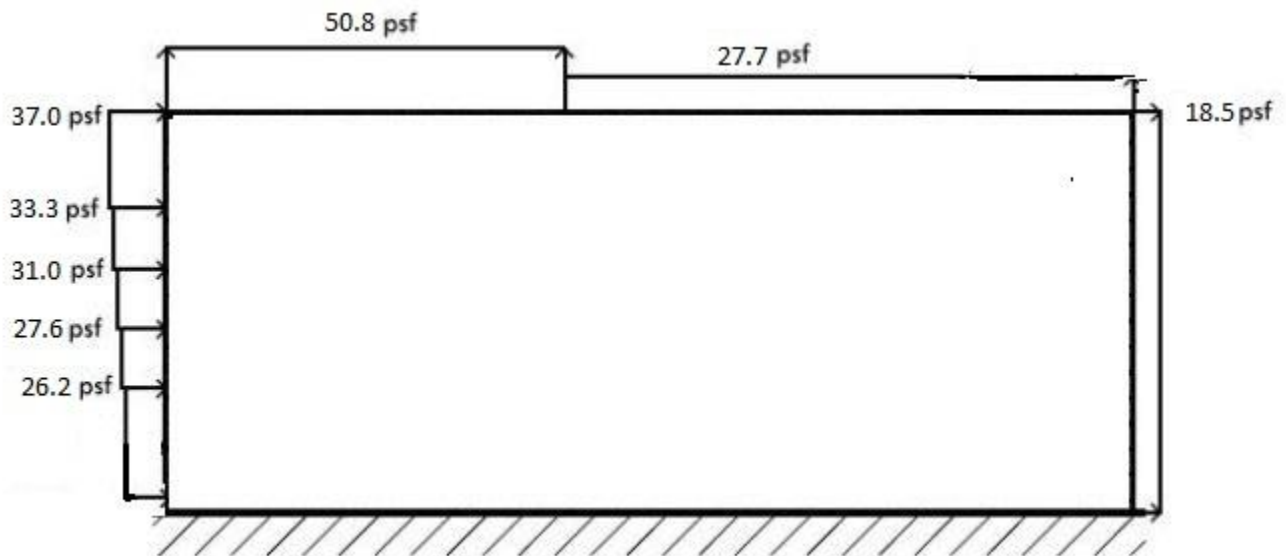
Wind Pressures acting on the West Wing, North and South facades
